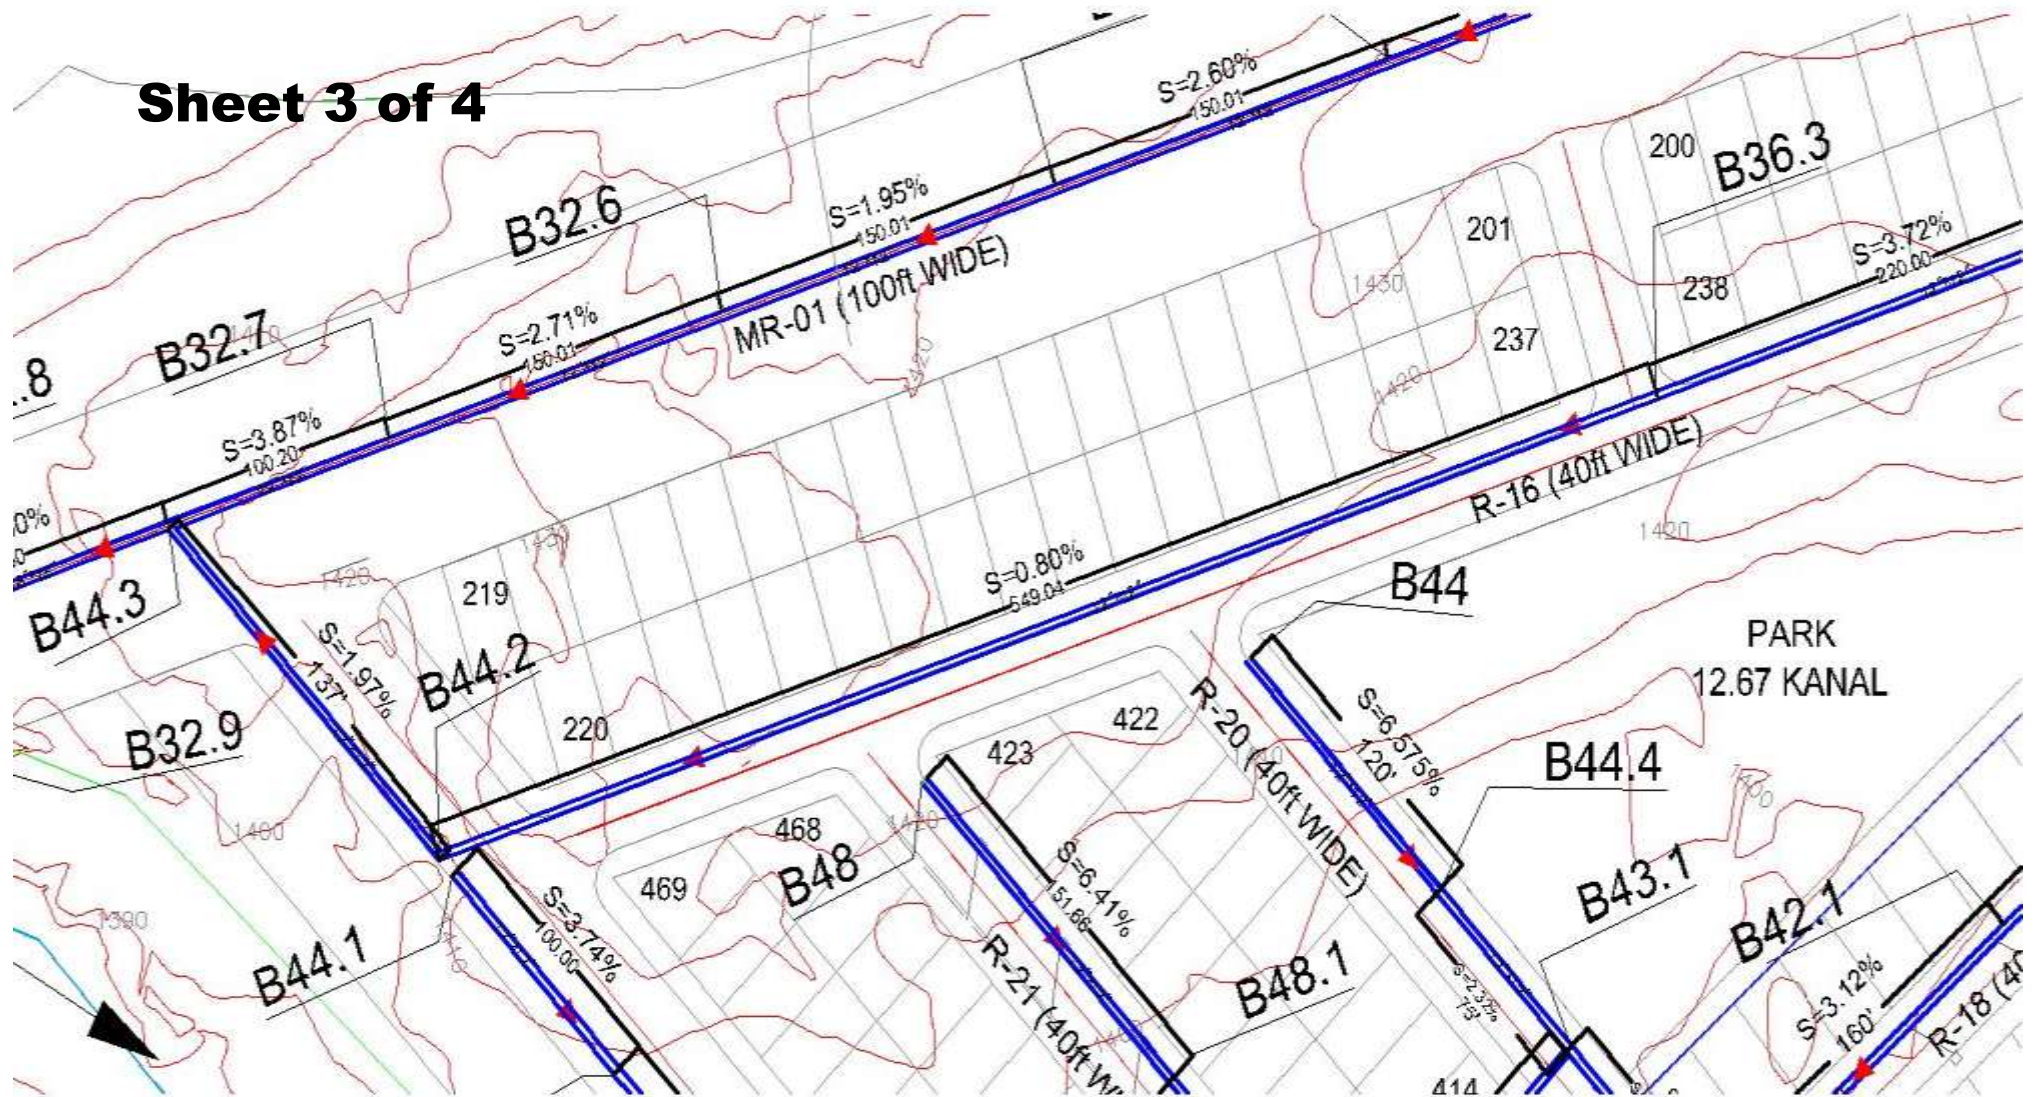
Storm drainage layout plan of Sub-catchment-5 part three
